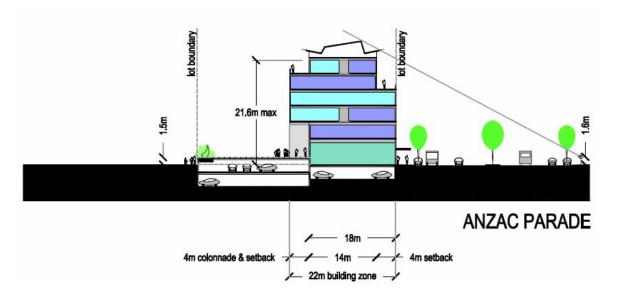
DCP's Proposed Development Cross Section East-West Looking North
